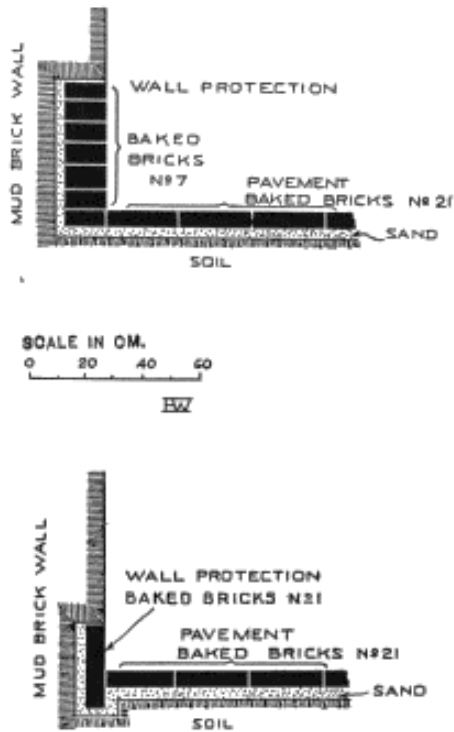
Tile floor construction and two methods of wall protection in house of Shilwi-Teshub in Nuzi (after Starr, 1939, plan 37A).
